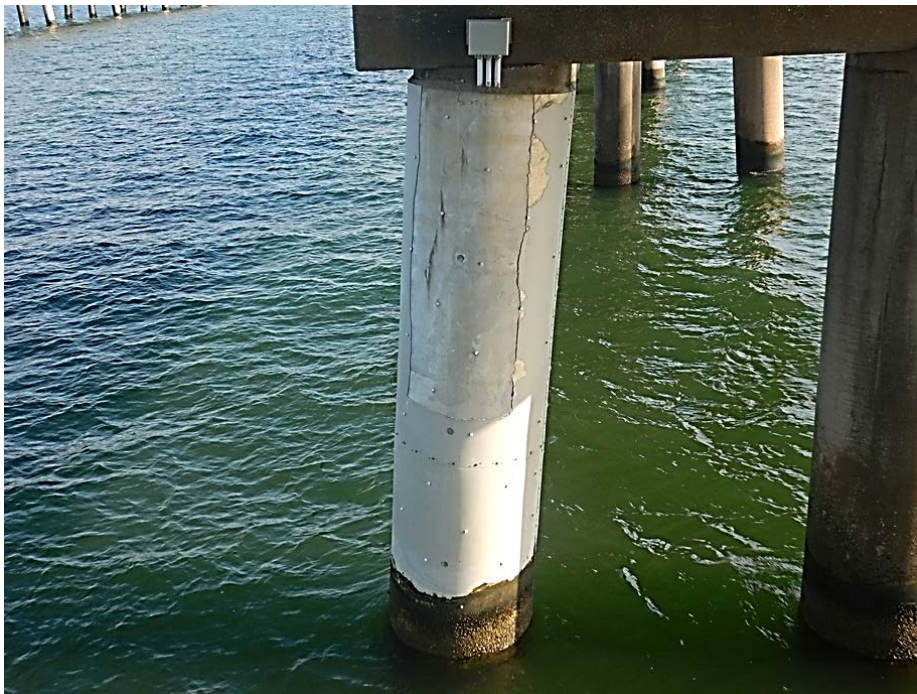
BNB127 Pile A – Life Jacket with Damaged Fiberglass Jacket, Cracking in Grout at Nylon Spacers, and Slightly Exposed Zinc Mesh (Looking North)
